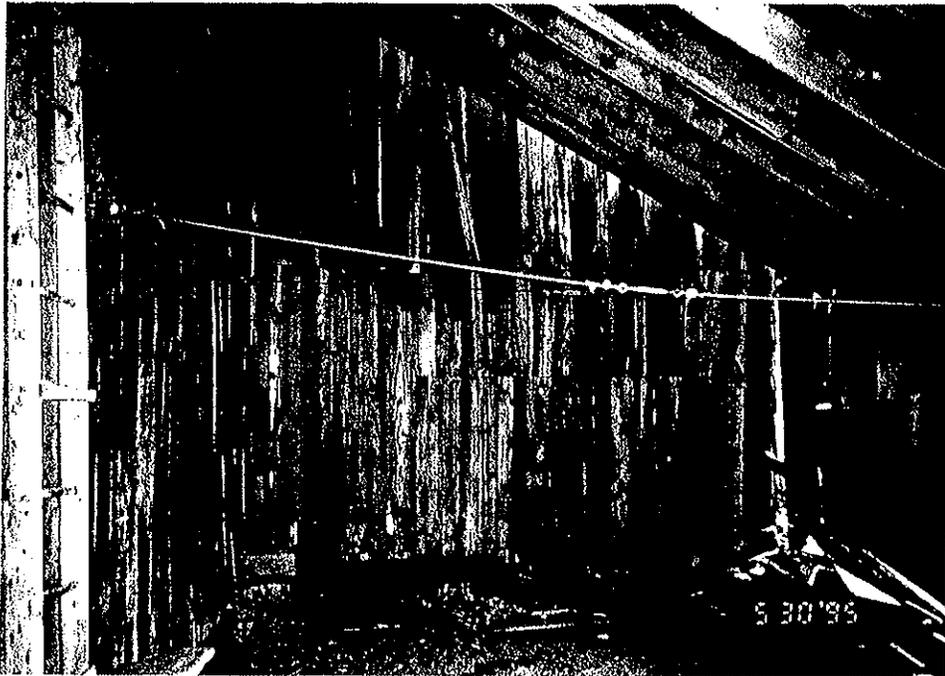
Weir Barn - Lean-To Shed [Room 104], South Wall (1995).
